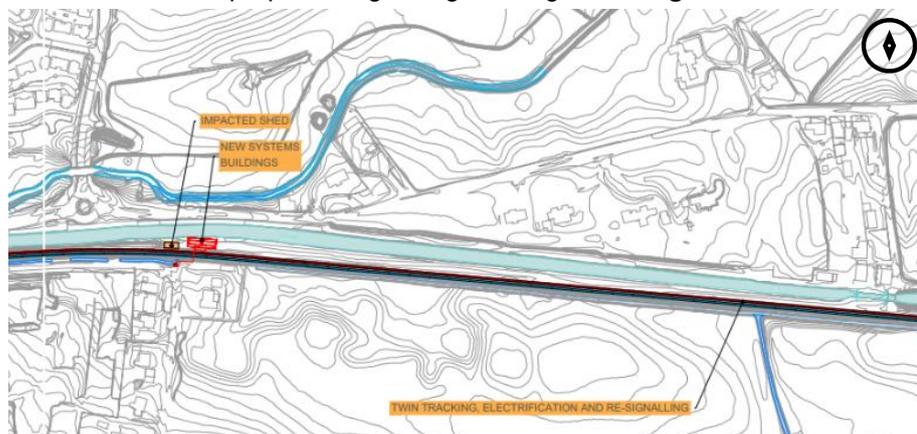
Plan Layout Chainage 93+120 to 94+940
